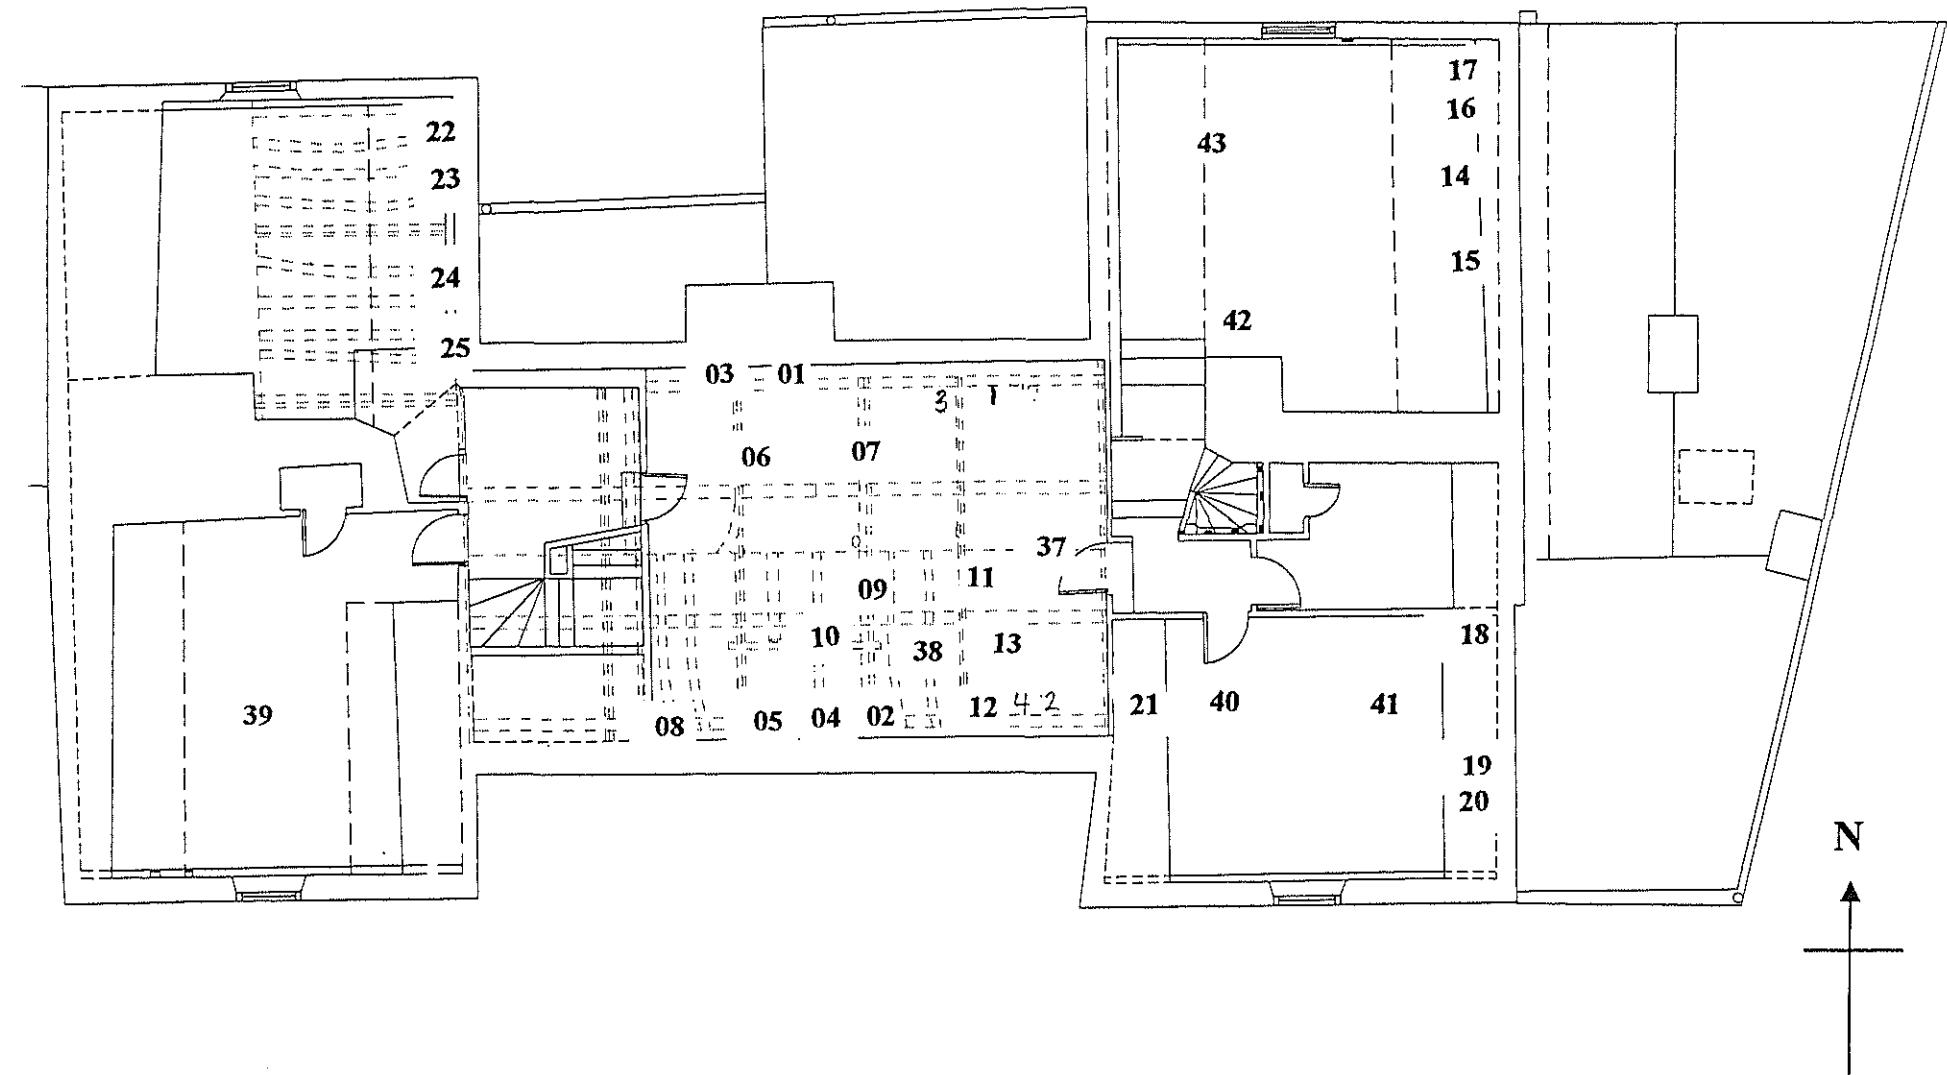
Plan at first-floor level to show approximate position of floor-frame timbers sampled
